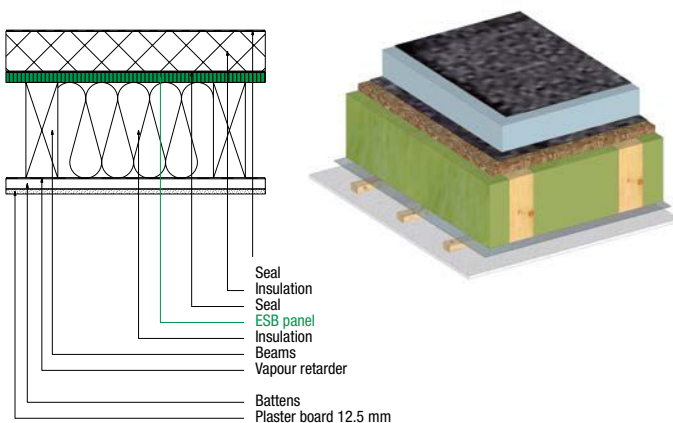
Unventilated flat roof with full insulation on the load-bearing plane
